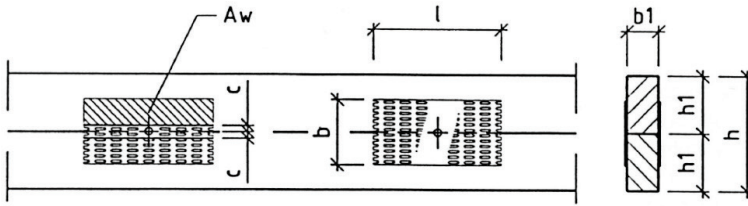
Timber-timber composite beam element made with punched metal plate fasteners according to Z-9.1-210 (DIBt, 2005)
